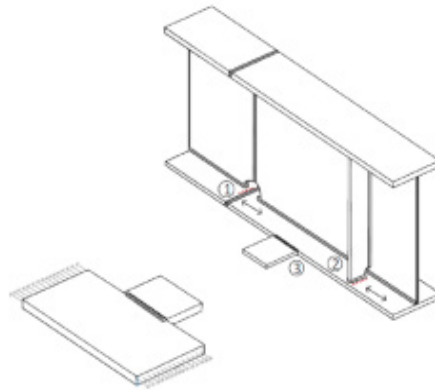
A typical bridge section with three different corresponding structural weld details;
